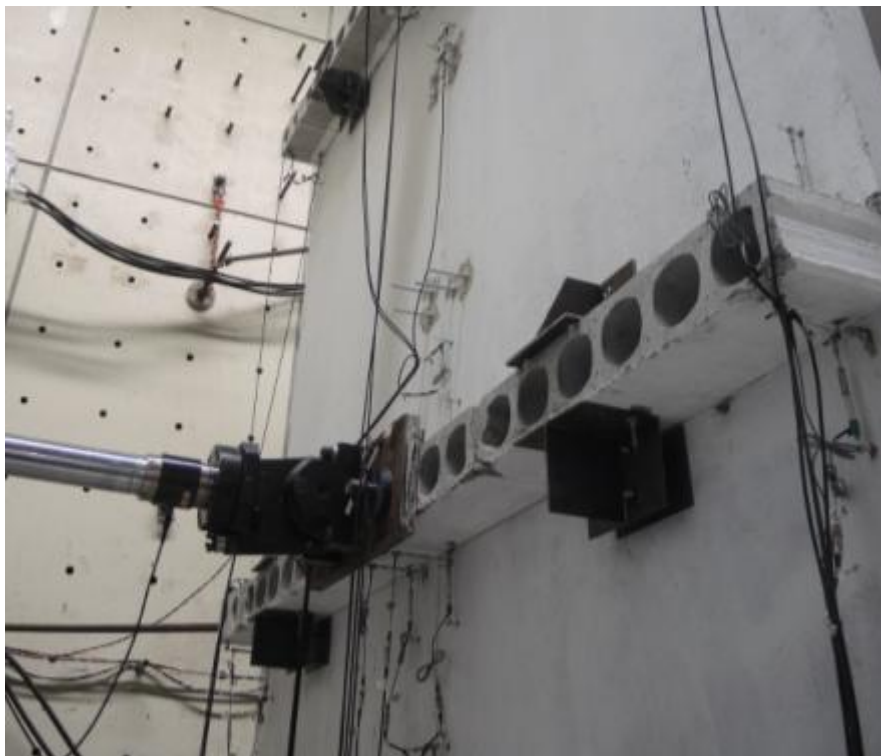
Detail of sliding restrainers – active configuration for testing the retrofitted specimen.
